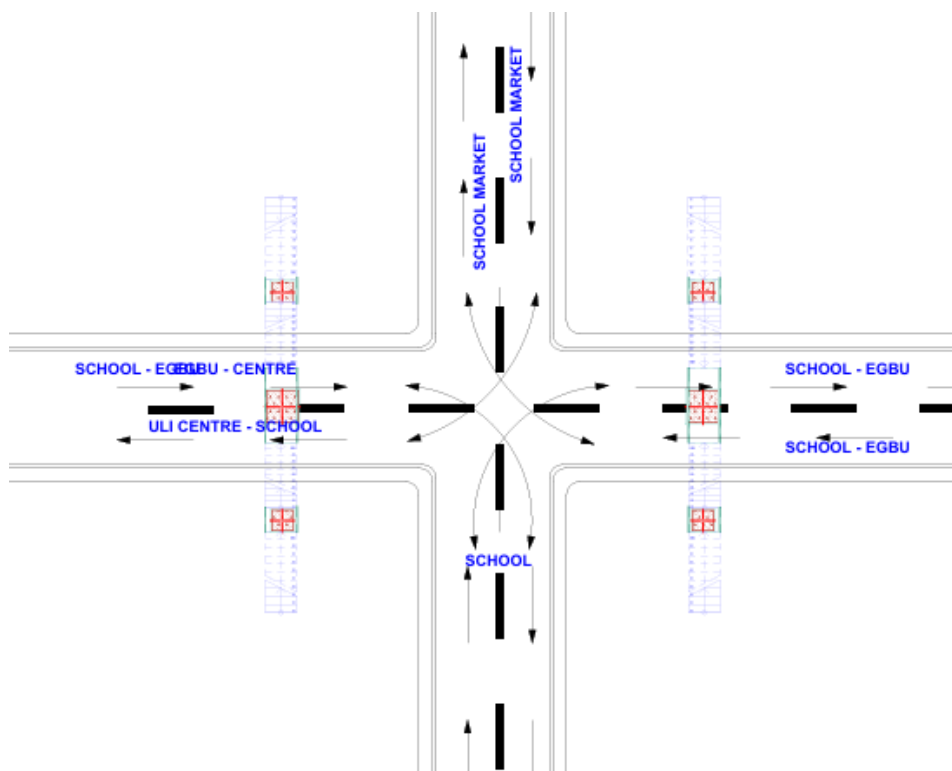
Intersection Layout Showing Pedestrian Crossings and Traffic Flow at COOU Main Gate
